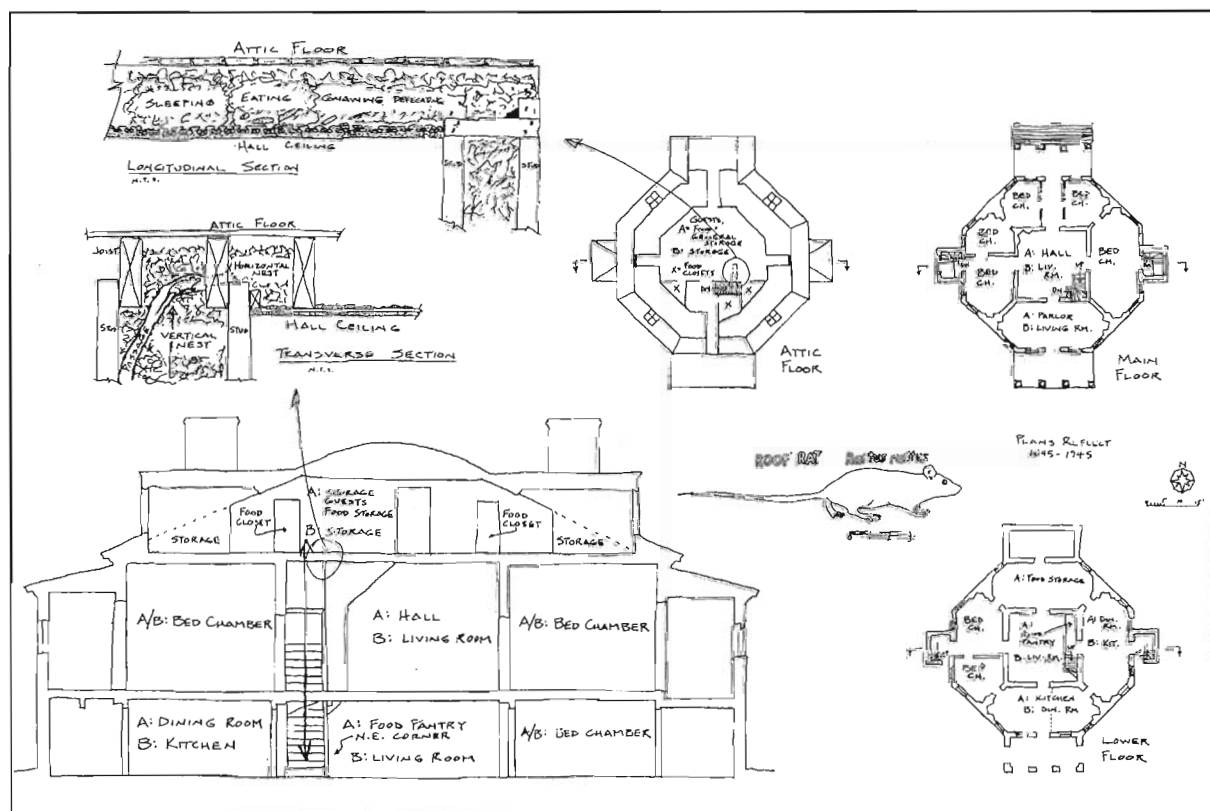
This hypothetical section view of Poplar Forest (post-Jefferson and preresoration) locates the vertical and horizontal nest in the attic staircase walls of the house as rebuilt in 1846. The location within the walls of the staircase was perfectly situated for vertical access, as shown in two eras, circa 1900 and post-1945. Drawing by the author.
